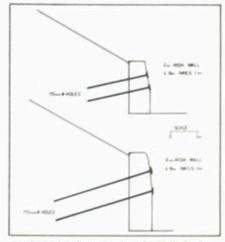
, Design Cross Sections for Nails for 2m and 3m High Wall Sections, Denholme Clough
